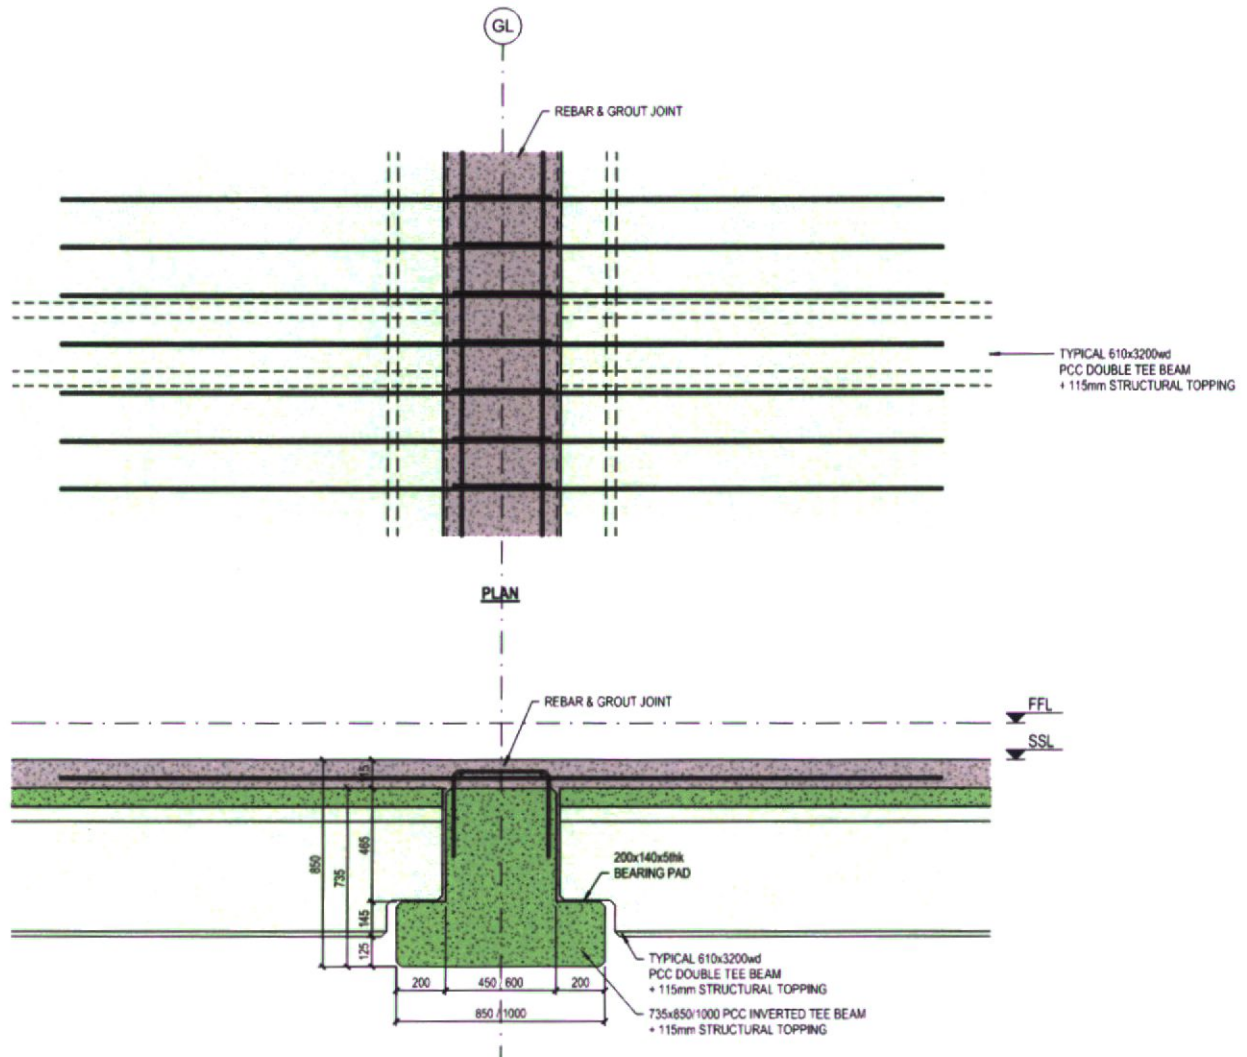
Typical Banagher Pre-cast Concrete Double Tee Beam Detail
